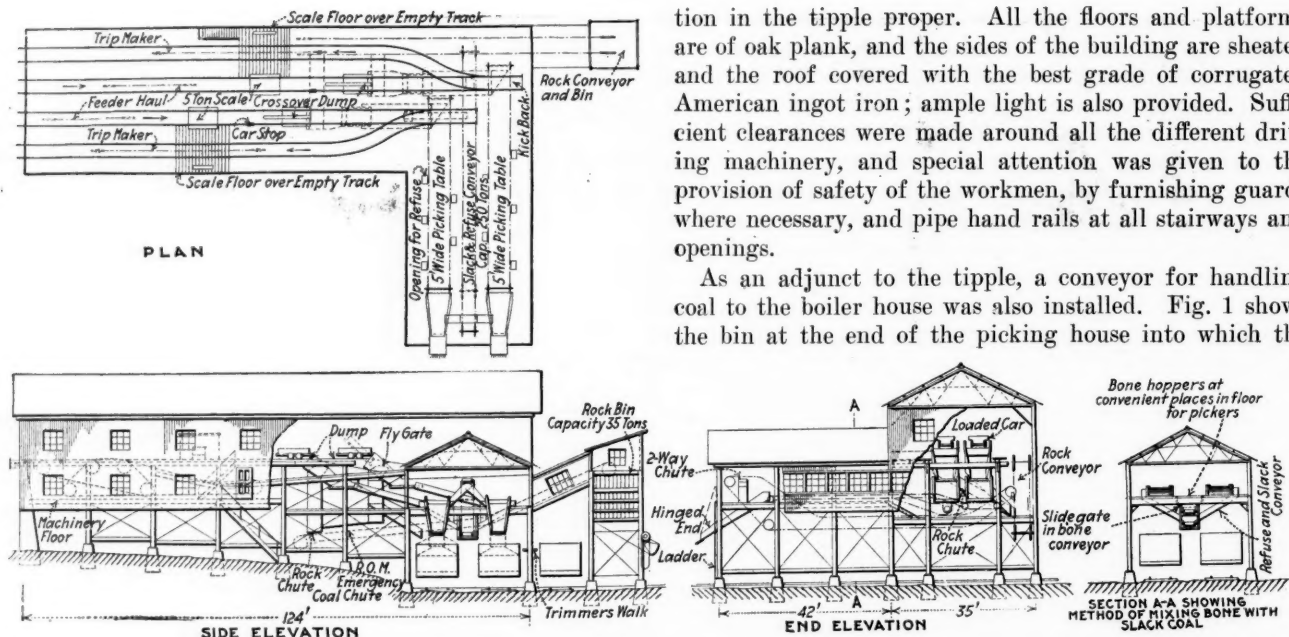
DIAGRAMMATIC PLAN, ELEVATIONS AND SECTION OF THE TIPPLE
